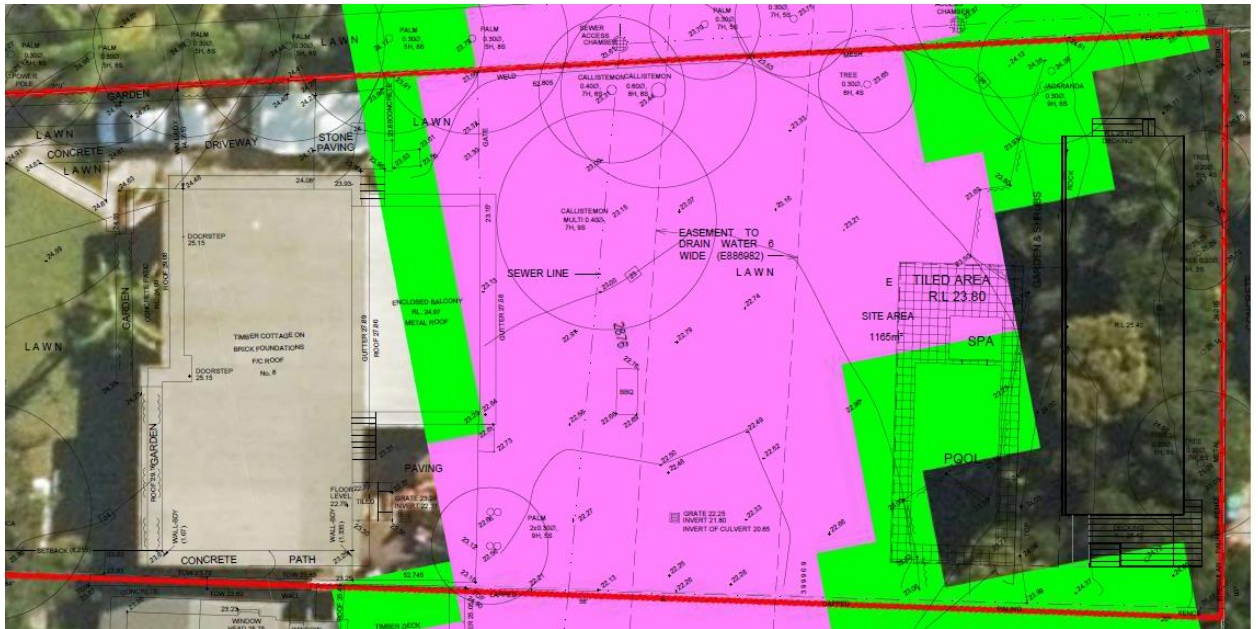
Ground floor plan overlay with 1% AEP Flood hydraulic category map
